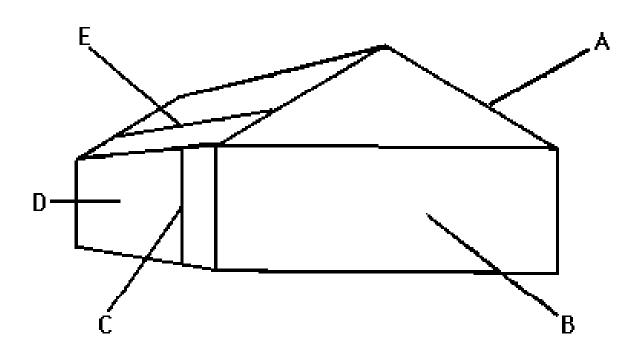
Basic structural components of a greenhouse: A)rafter, B) end wall, C) side post, D)side wall, E) purlin.
